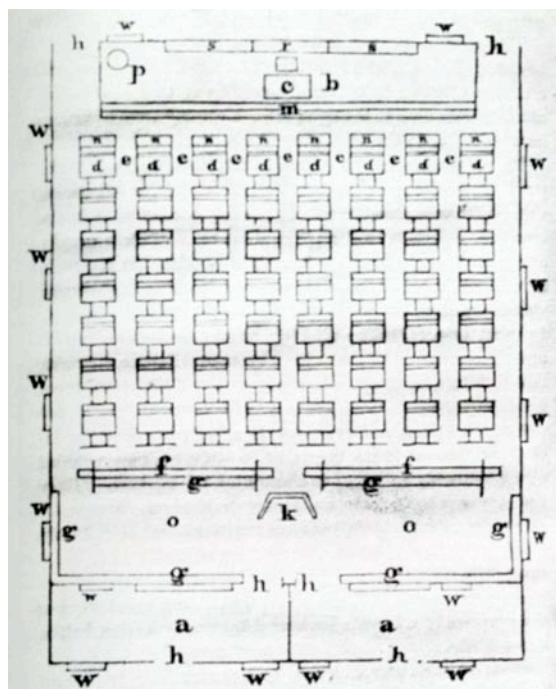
Floor plan showing suggested furniture arrangement, by Alcott
